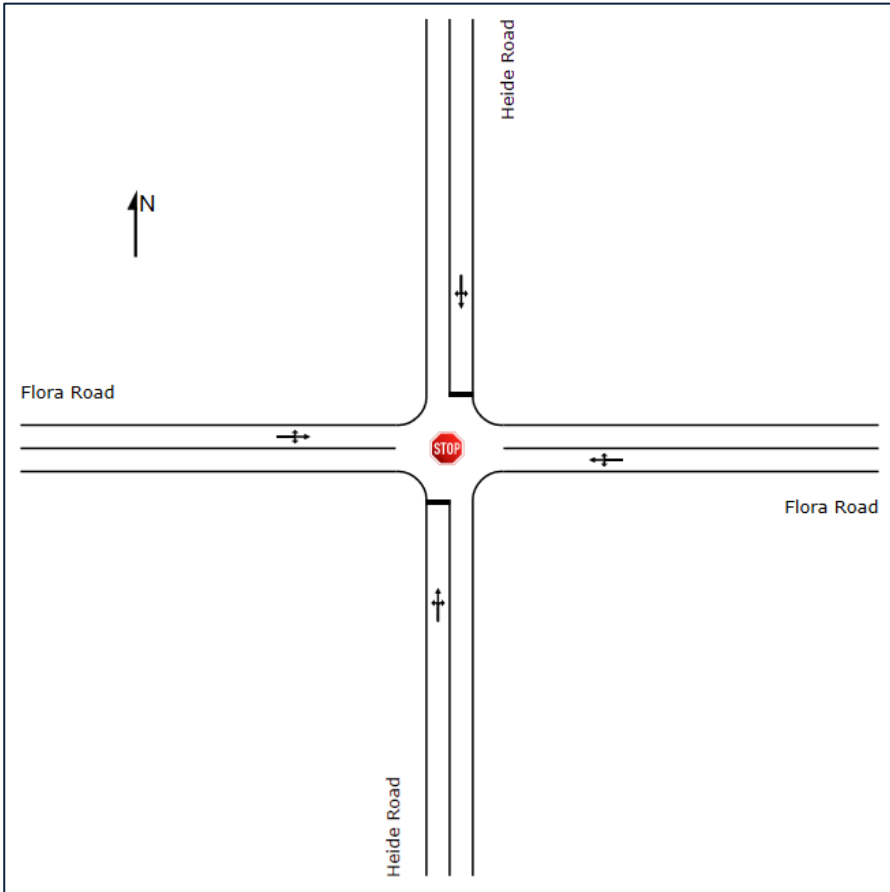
Proposed Intersection Layout: Heide Road and Flora Road
